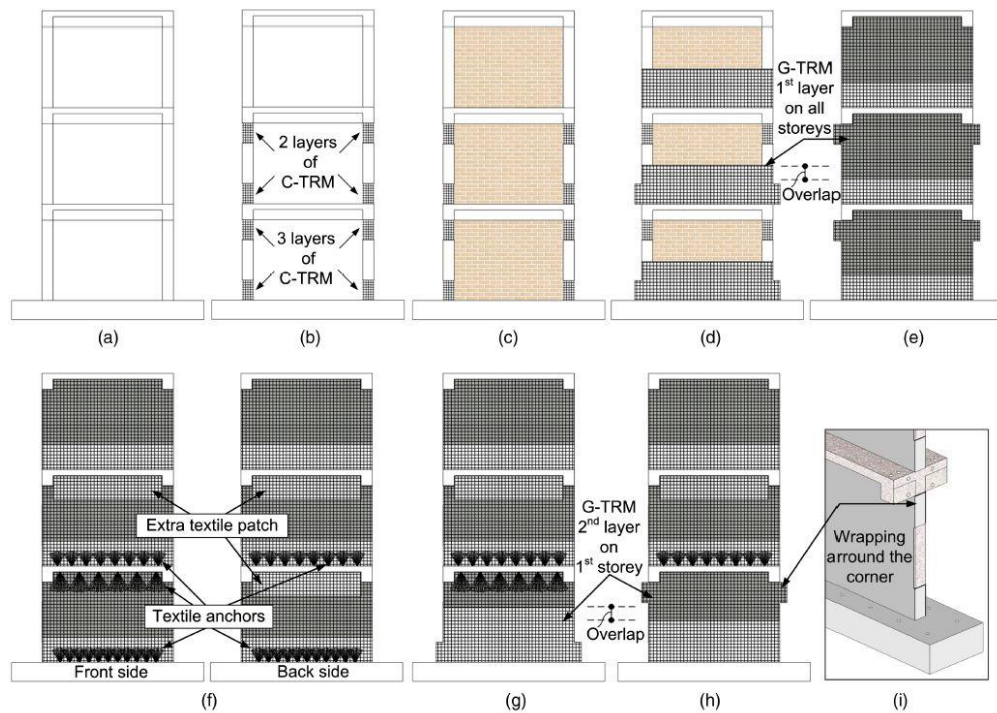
Strengthening scheme application steps: (a) bare frame; (b) shear strengthening of first and second story columns at shear-critical regions; (c) infilling with masonry; (d) application of first TRM layer on the face of masonry infills, bottom part of the textile; (e) application of first TRM layer on the face of masonry infills, top part of the textile; (f) application of textile anchors and extra textile patches on the front and back side of the specimen,
